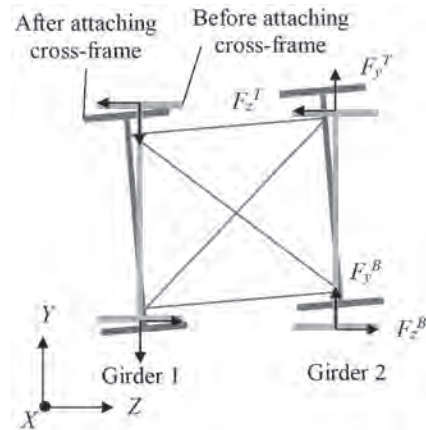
Fit-up forces required to attach the cross-frames to the girders.
